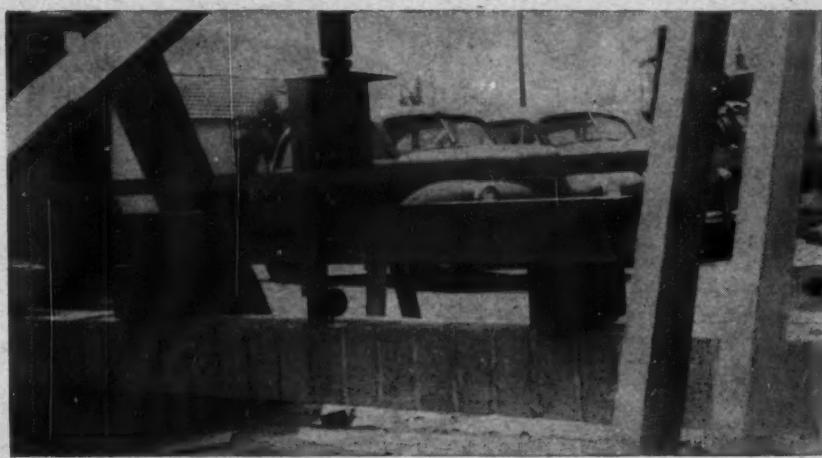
Reinforced beam placed in horizontal position for testing. Frames used for wall flexure tests were adapted to the testing of the beams
